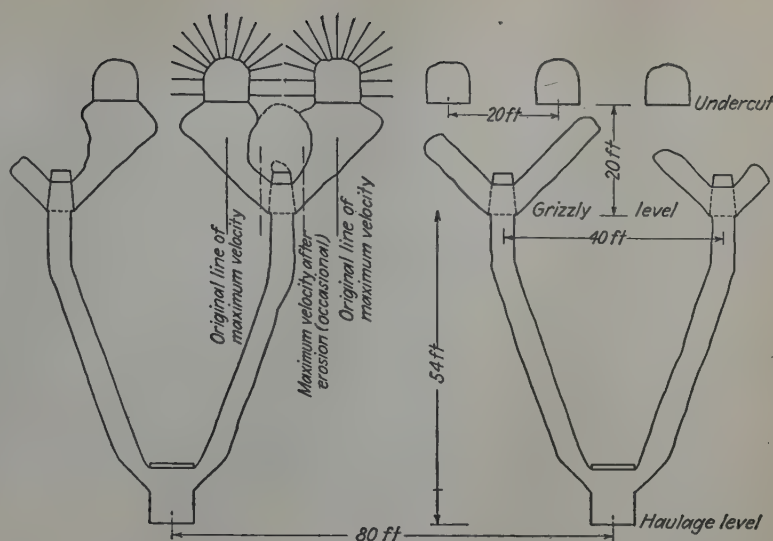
Section through undercut, grizzly and haulage drifts, showing "ring drilling" for undercut.
